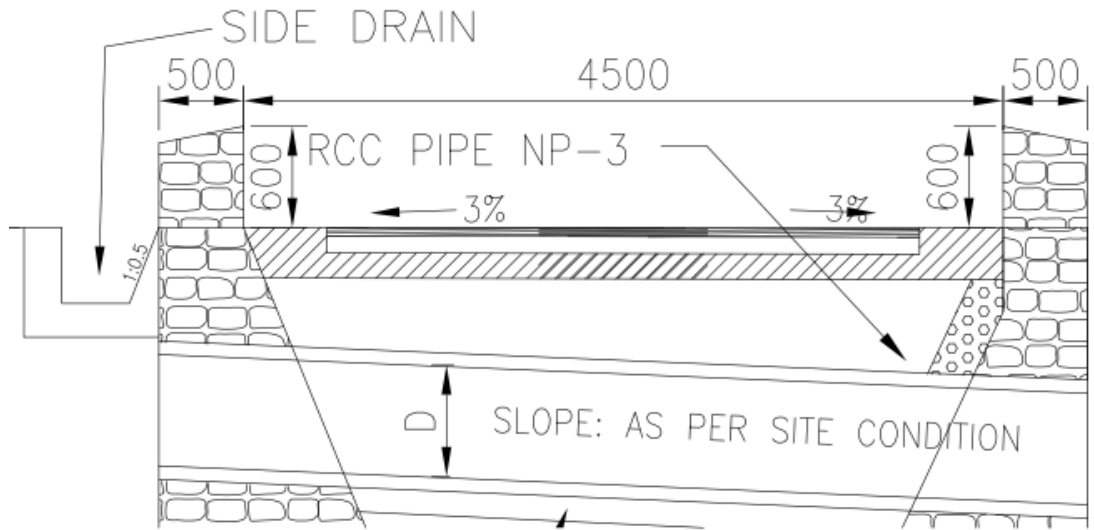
Typical Cross-section of a Pipe Culvert on Single-lane Road
